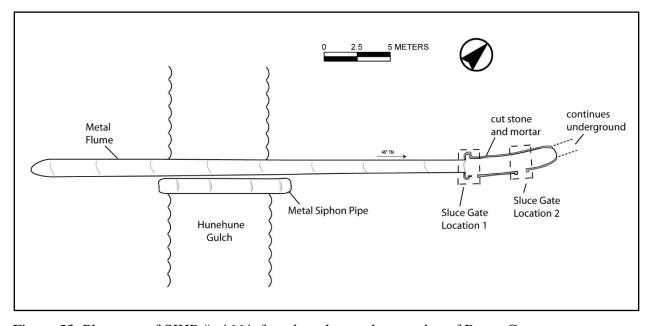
Plan map of SIHP # -4664, found on the southwest edge of Ramp C
